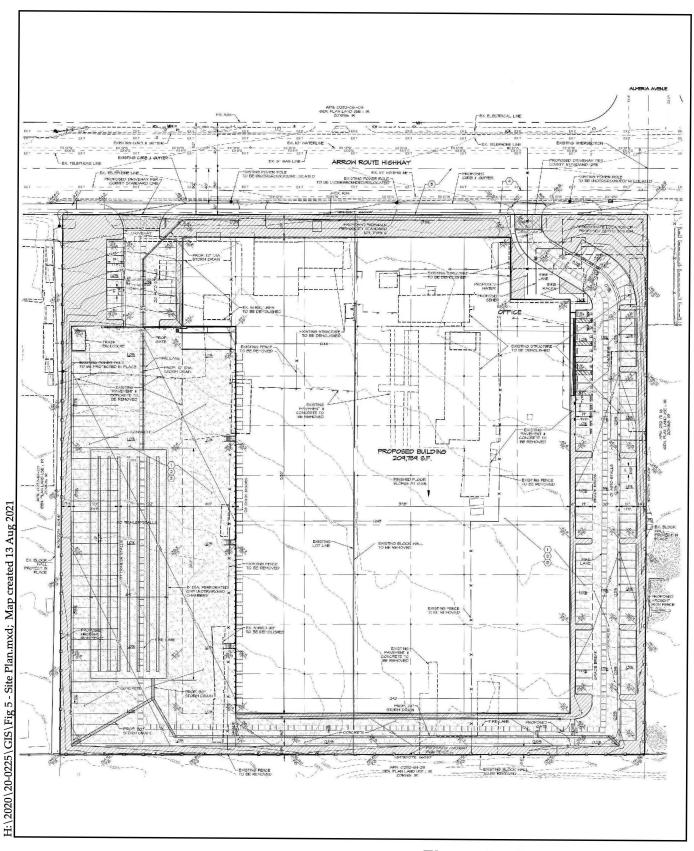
Proposed Site Plan 15719 and 15755 Arrow Route Warehouse
